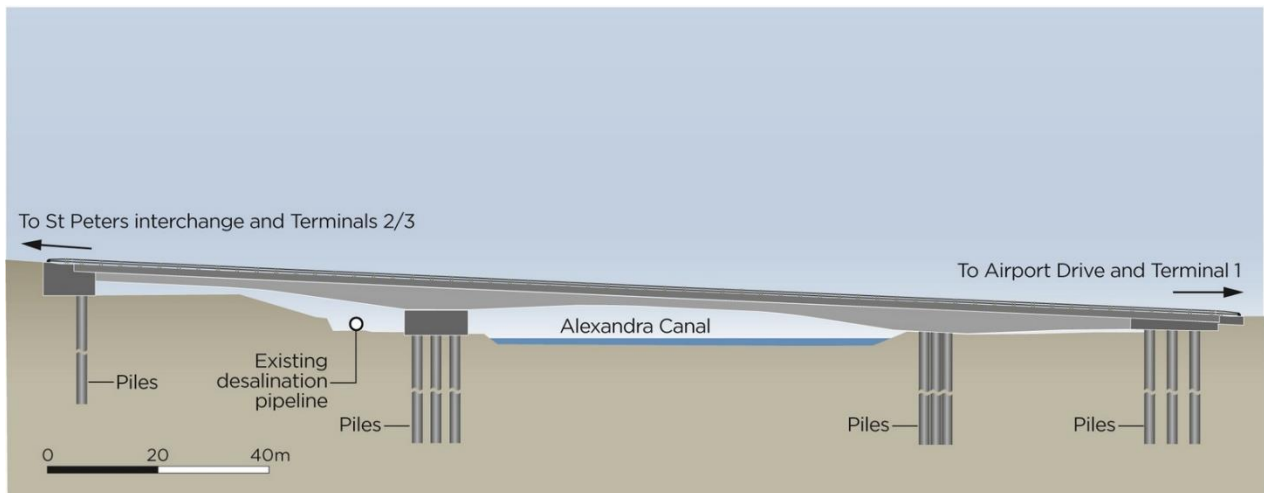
Preferred balanced cantilever concrete bridges for the Terminal 1 connection bridge
